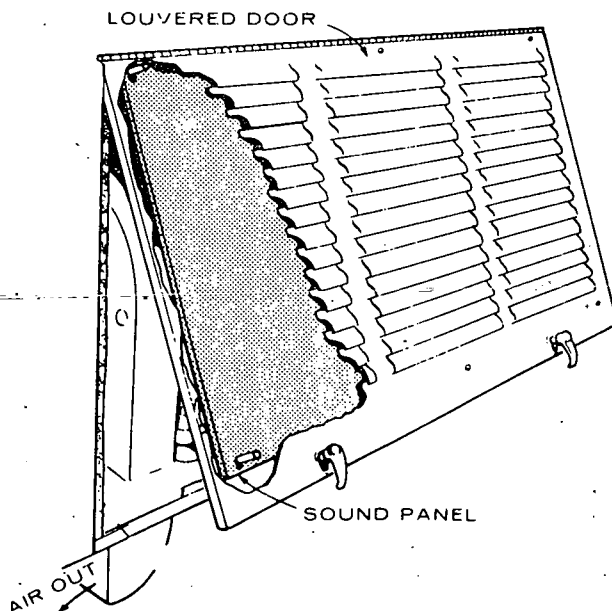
TYPICAL LOUVERED DOOR AIR INLET
